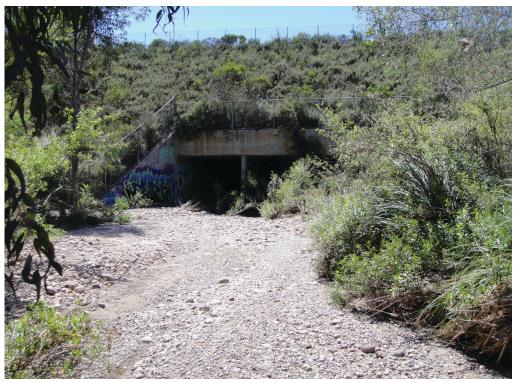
Box culvert inlet for Carroll Canyon Creek, at Camino Santa Fe. Looking west.
